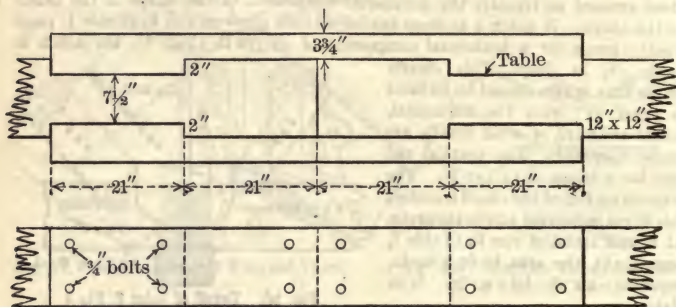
A. Alternate Detail for Splice of Bottom Chord
